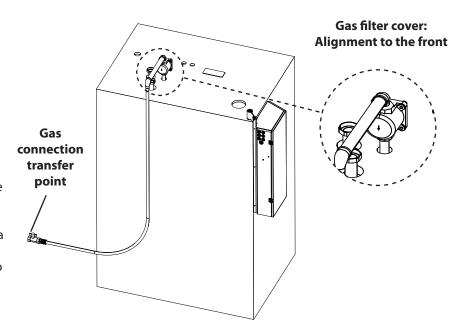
Dachs Pro 20 ST rear view - assembled gas connection
